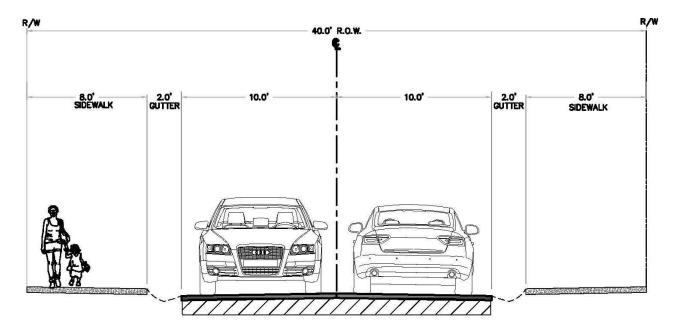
Proposed Conceptual Typical Section, 40' Right-of-way – Wider Sidewalks or On-Street Parking
